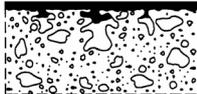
Sections of the new concrete plate constructed on the upstream face of the dam, at the end of the 2004 summer construction period
